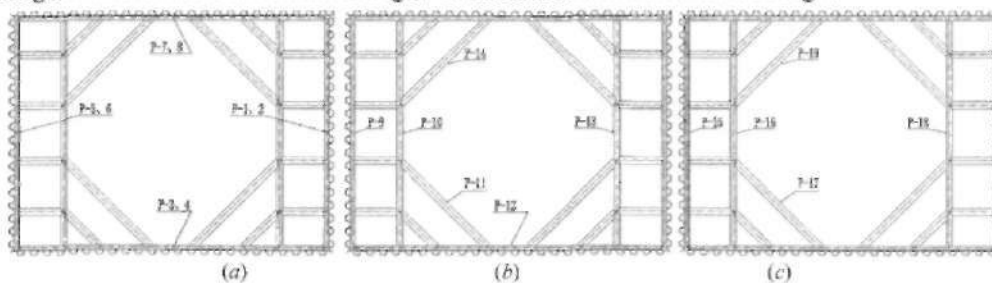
Gauging points on steel sheet pile (a: Gauging points on steel sheet pile; b: Gauging points on the 2<sup>nd</sup> ring beam and inner supporting; c: Gauging points on the 3<sup>rd</sup> steel sheet pile)
